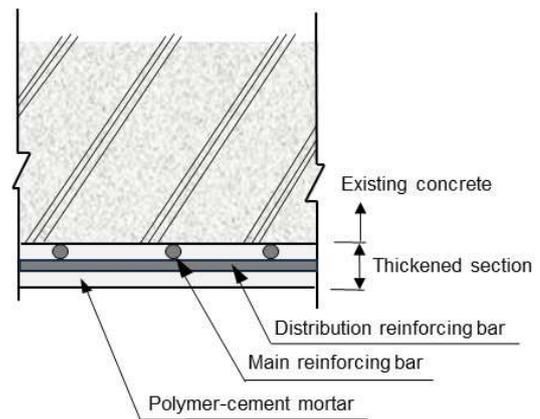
Example of Cross-Section of Bottom-Surface Jacketing Method
